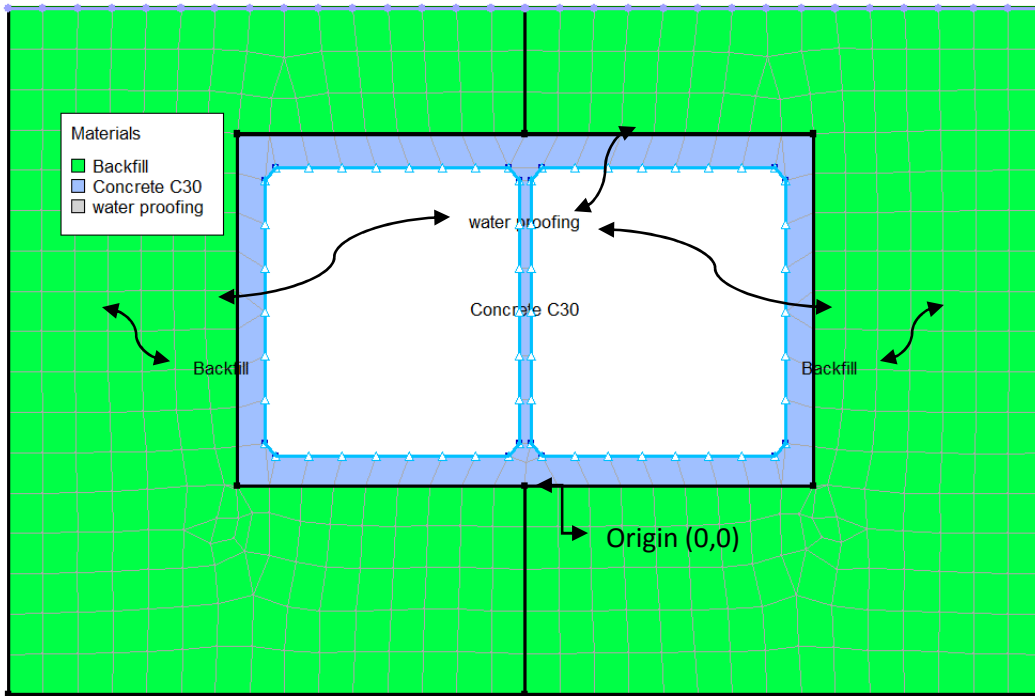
Condition-2 with waterproofing (applied on external surface of the tunnel)
